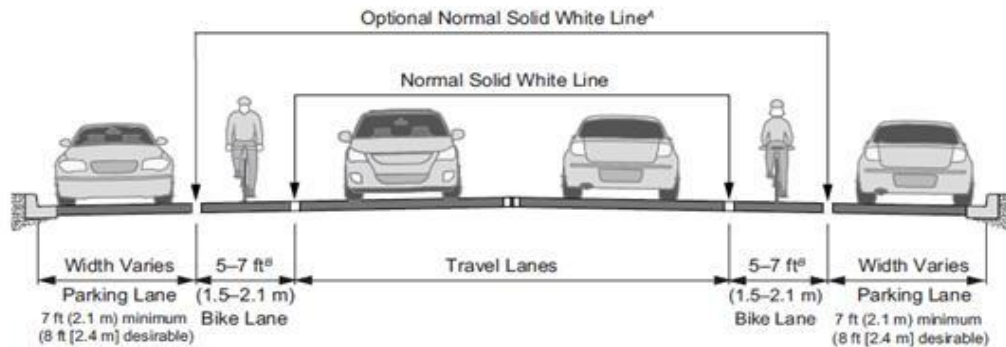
On-Street Parking, Travel lane and Bike lane illustration for Main Street
